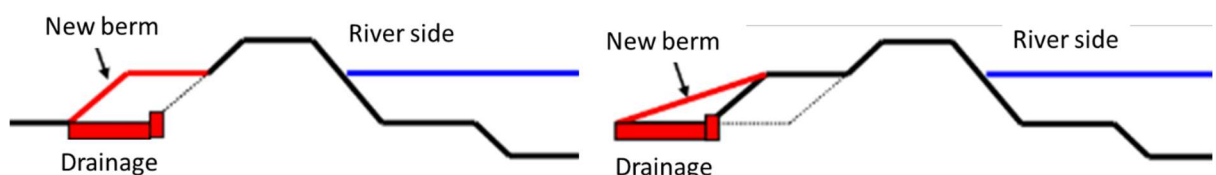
Typical cross section after construction of the berm for a) an embankment without previous berm, and b) an embankment with existing berm.
